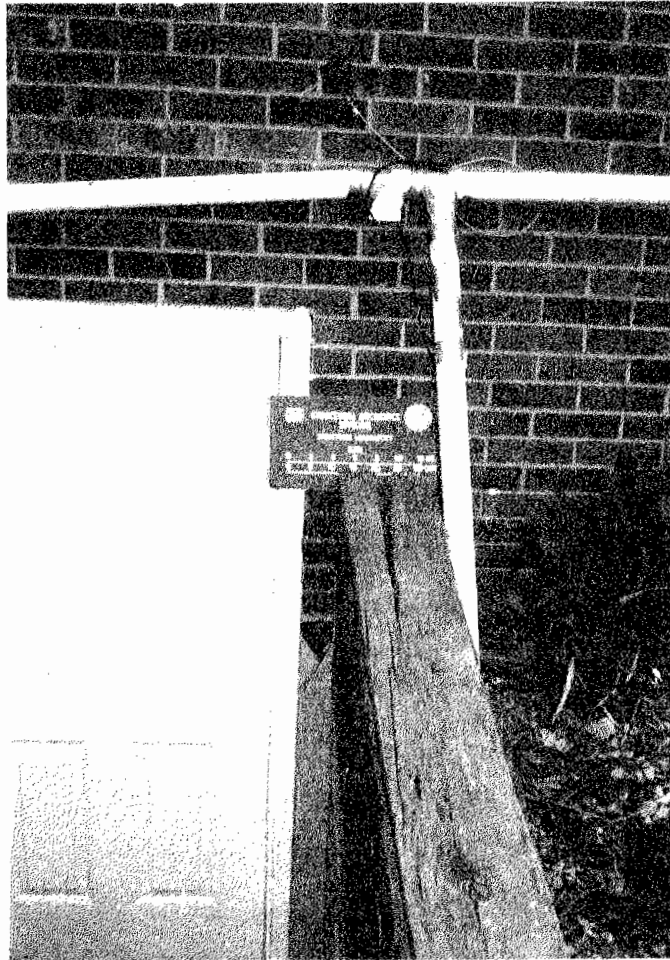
View of horizontal exterior accelerometer locations on the east wall above and below the first floor level (top accelerometer is on the exterior face of the brick veneer; bottom accelerometer is on the exterior face of the block of the basement wall)
